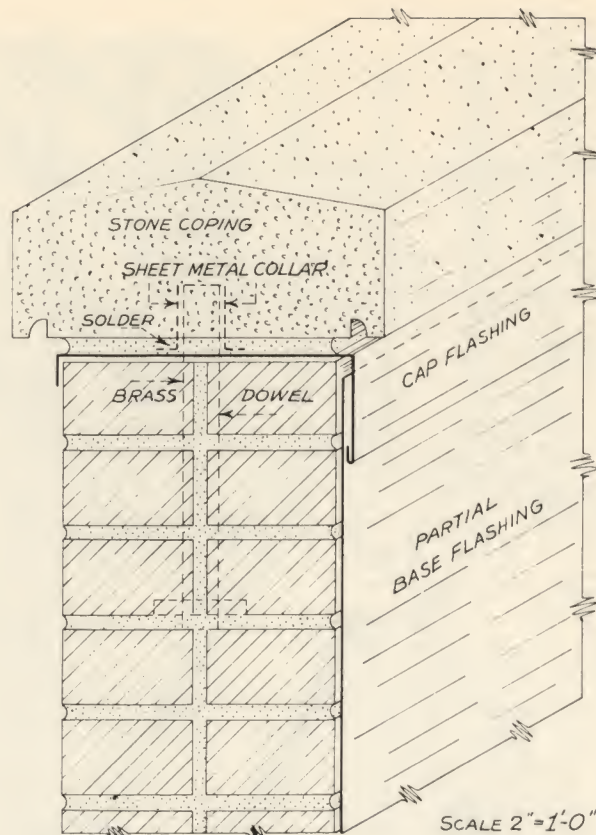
METHOD OF FLASHING A BRICK PARAPET WALL NOT OVER 16 IN. ABOVE ROOF LINE—CAP FLASHING TO COVER FULL WIDTH OF WALL UNDER COPING
